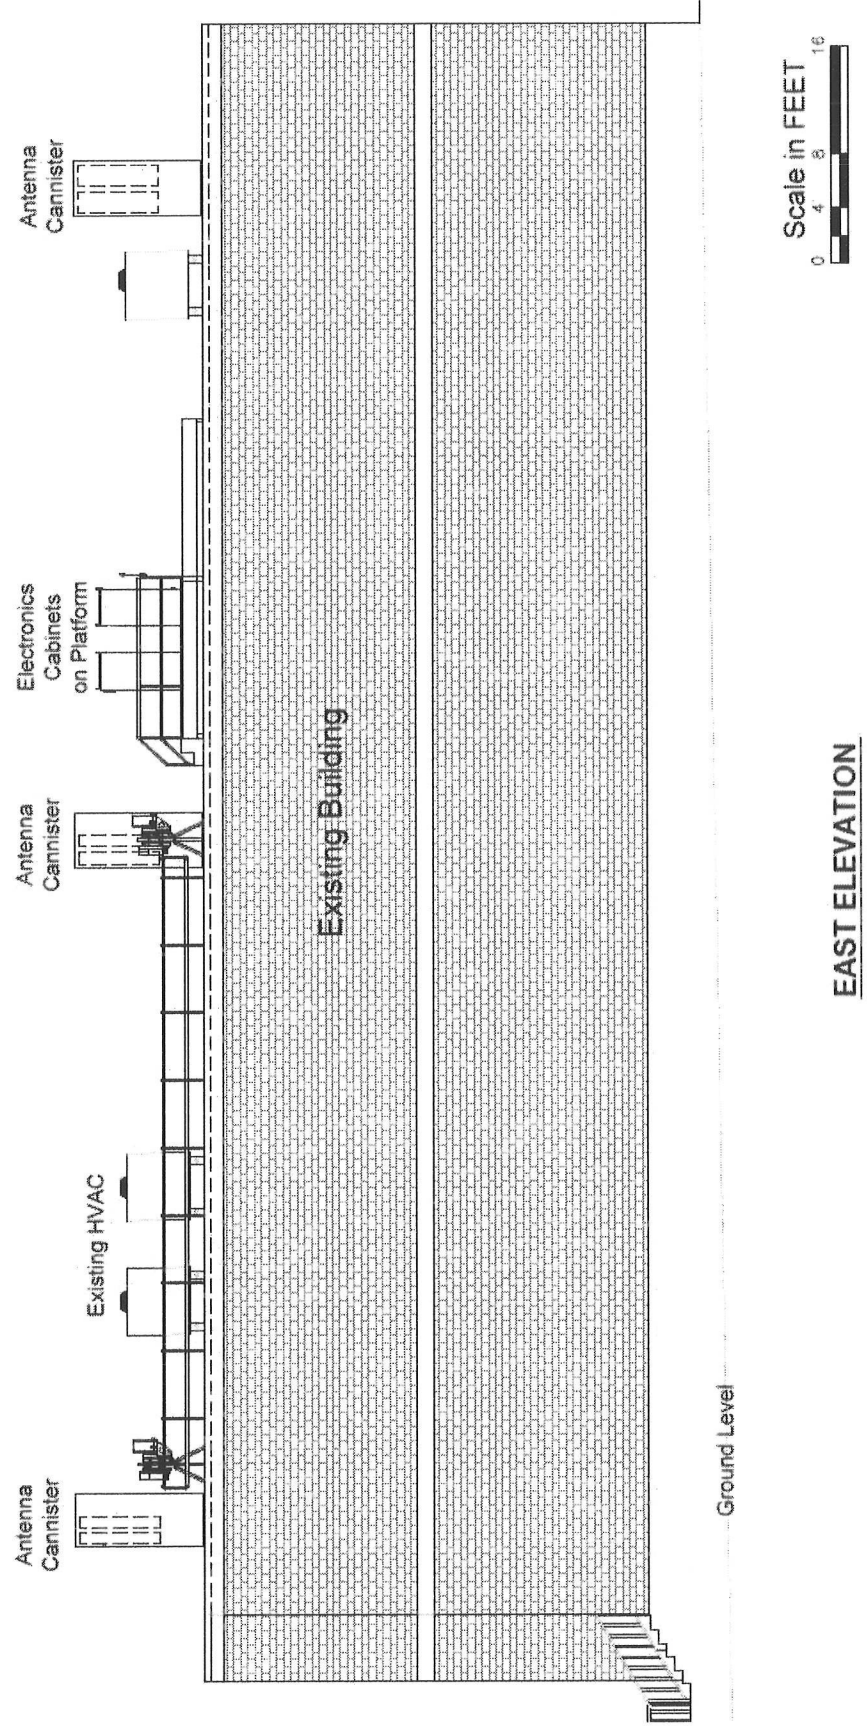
Elevation Plan Showing the Vertical Character of the Building and Proposed Antenna Canisters
